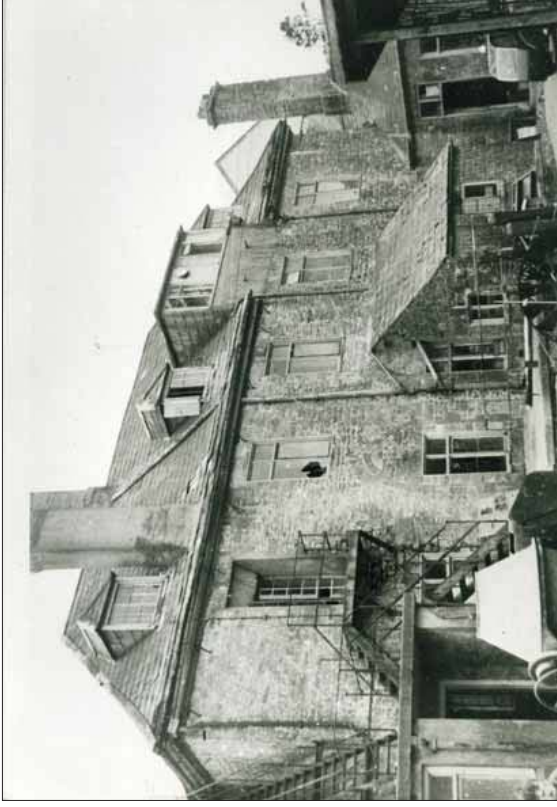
Photo of north facing elevation of the northern range prior to demolition showing blocked archways
